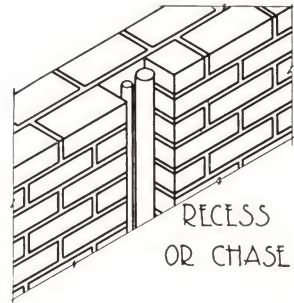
The method of building in chases for pipes or conduits in the backing of a brick wall.
